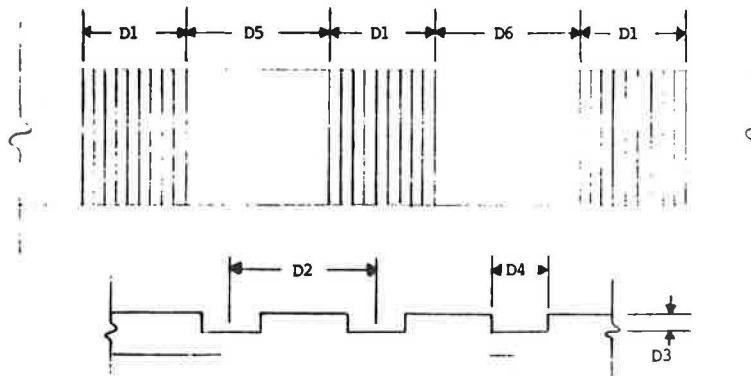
Strip layout: Site 2, Edens Expressway, and Site 3, US-12.
